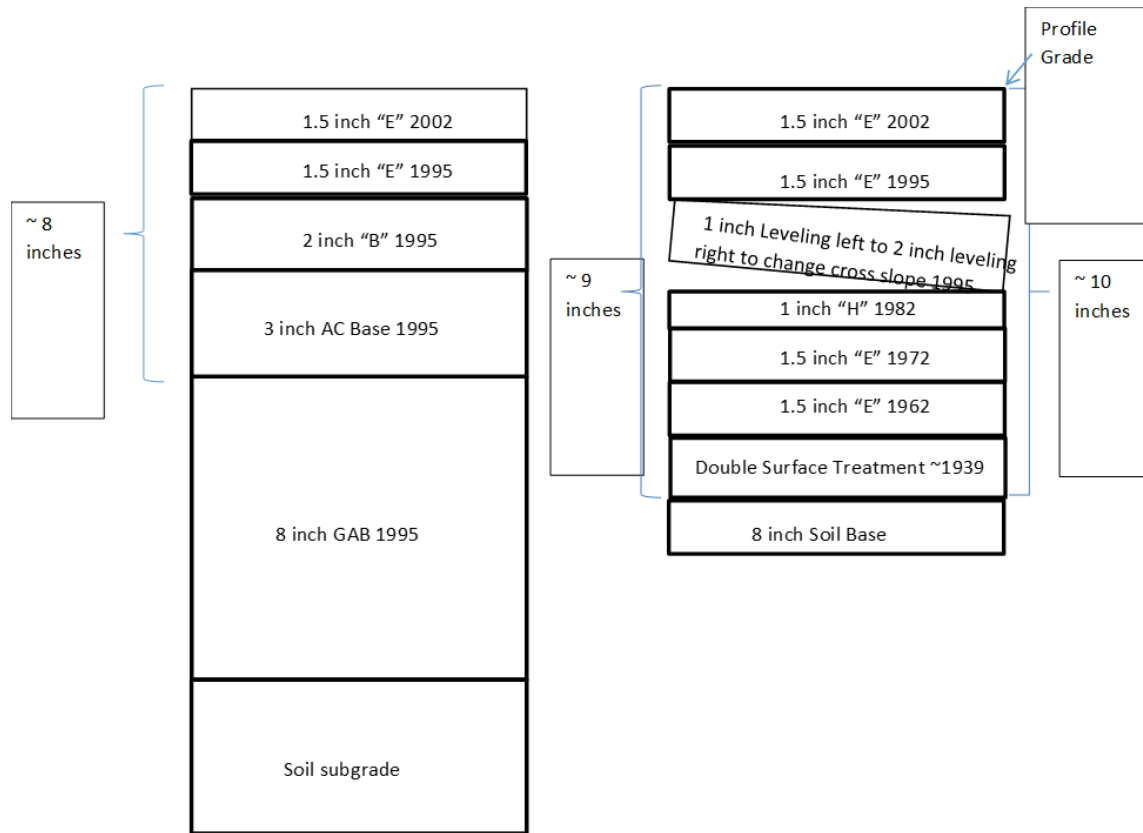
Illustration of pavement designs of travel lane (left) and passing lane (right)
